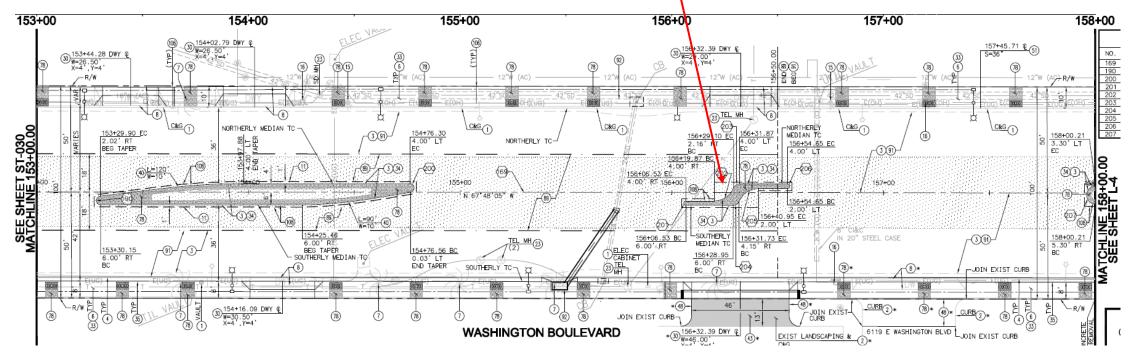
Temporary Construction and Access Easement Agreement at ARCO
